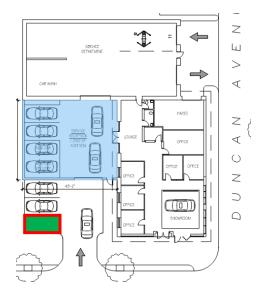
One parking space at 1801 Mount Vernon Avenue, outlined in red, is recommended for removal and for replacement with open space. The area recommended for open space and landscaping is indicated in green.
